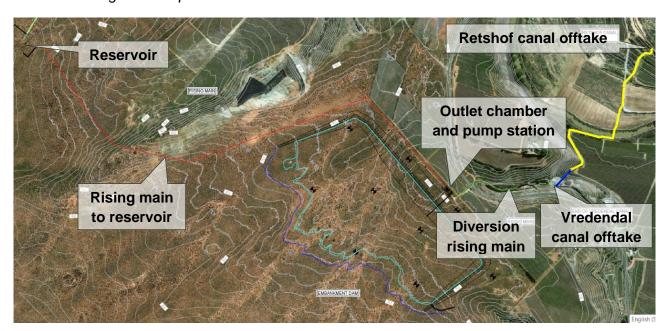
Ebenhaeser Balancing Dam and supply/connection pipe layout
